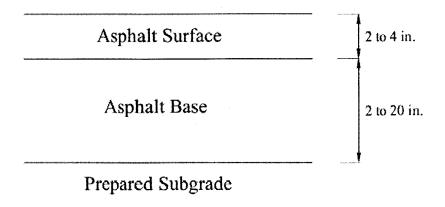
A Typical Cross Section of a Full-Depth Asphalt Pavement.
